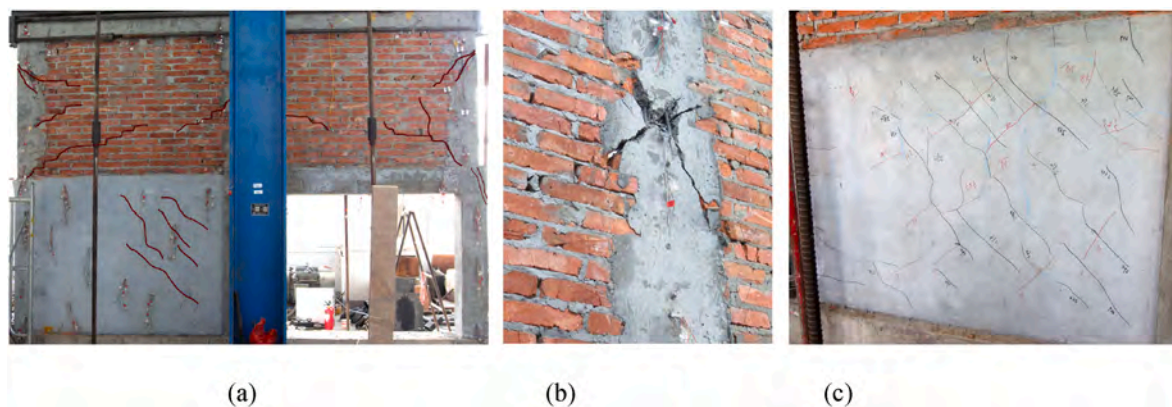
Failure modes of specimen W3: (a) Primary cracks of W3; (b) Diagonal cracks of middle tie-column in the 2nd floor; (c) Cracks of polymer mortar jacketing.
